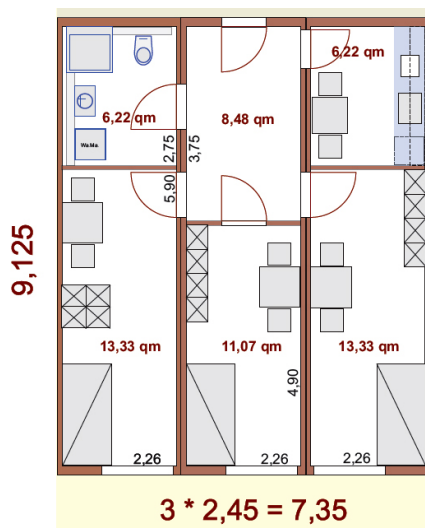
Floor plan of one apartment in a purpose-built, modular housing project for refugees. The apartments are designed for (up to) six people who share a bathroom, a kitchen and three bedrooms, furnished with bunk beds, a table, two chairs, and metal lockers. Source: Göttingen City website in 2016.
